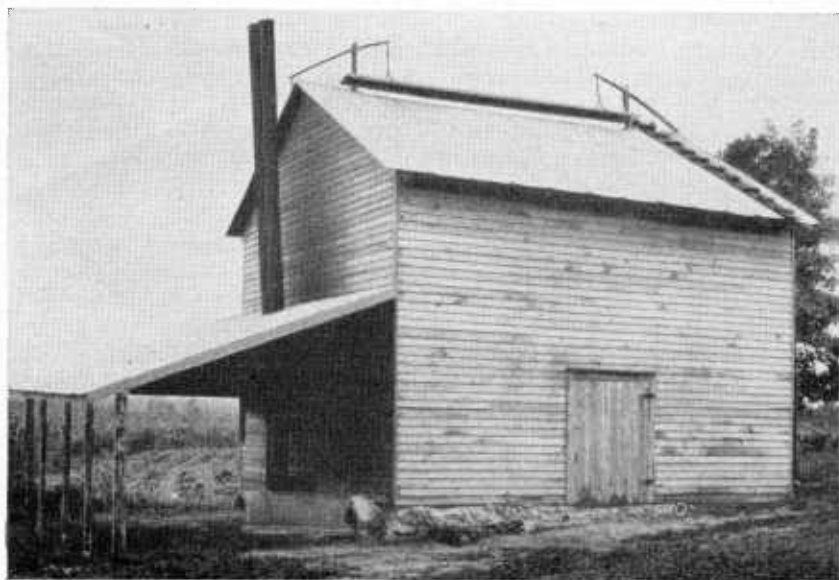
Barn for flue-curing tobacco, with good roof ventilator and ventilation ports in foundation.
